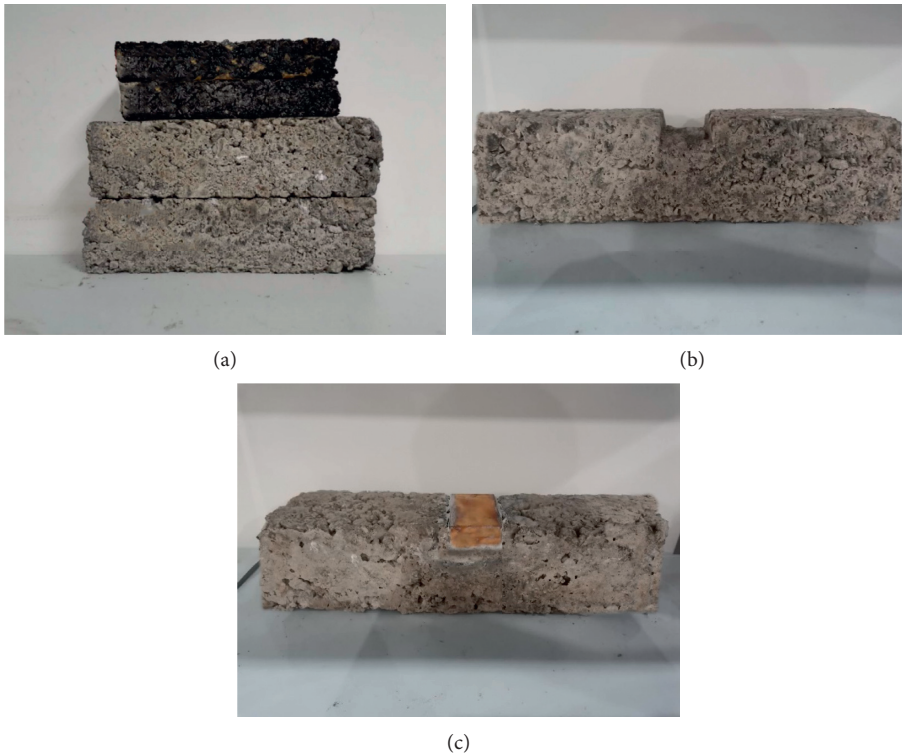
Different working conditions for structural layer model specimens. (a) Complete model test piece of pavement structure. (b) Model test piece of structural layer void. (c) Structural layer repair model test piece.
